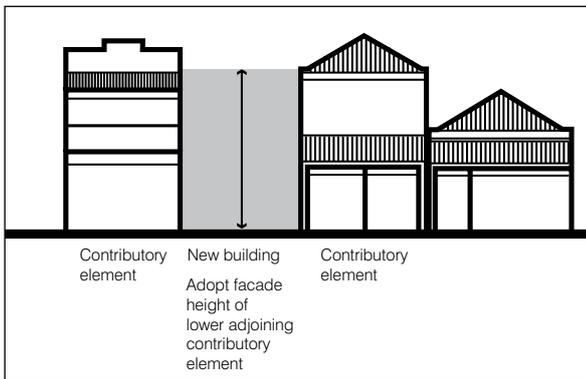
Facade height where a new building adjoins Contributory Element in a higher density setting
